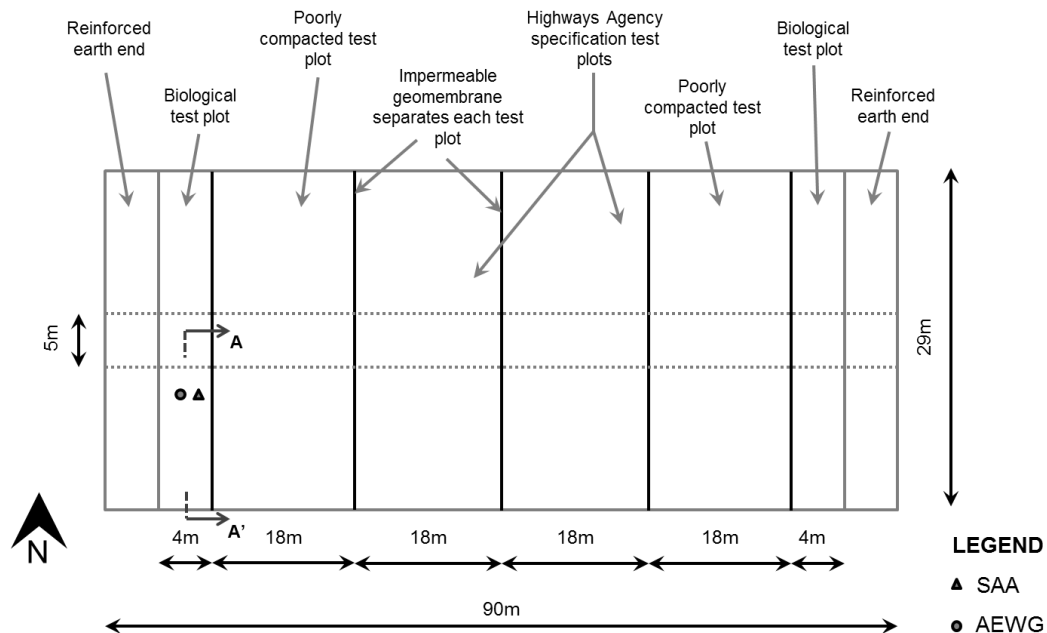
Diagram of full-scale embankment at Nafferton: instrumentation locations are highlighted on the slope being induced to failure (cross-section A-A' is shown in Figure 4.36) (redrawn after Hughes *et al.* 2009; Glendinning *et al.* 2014)
